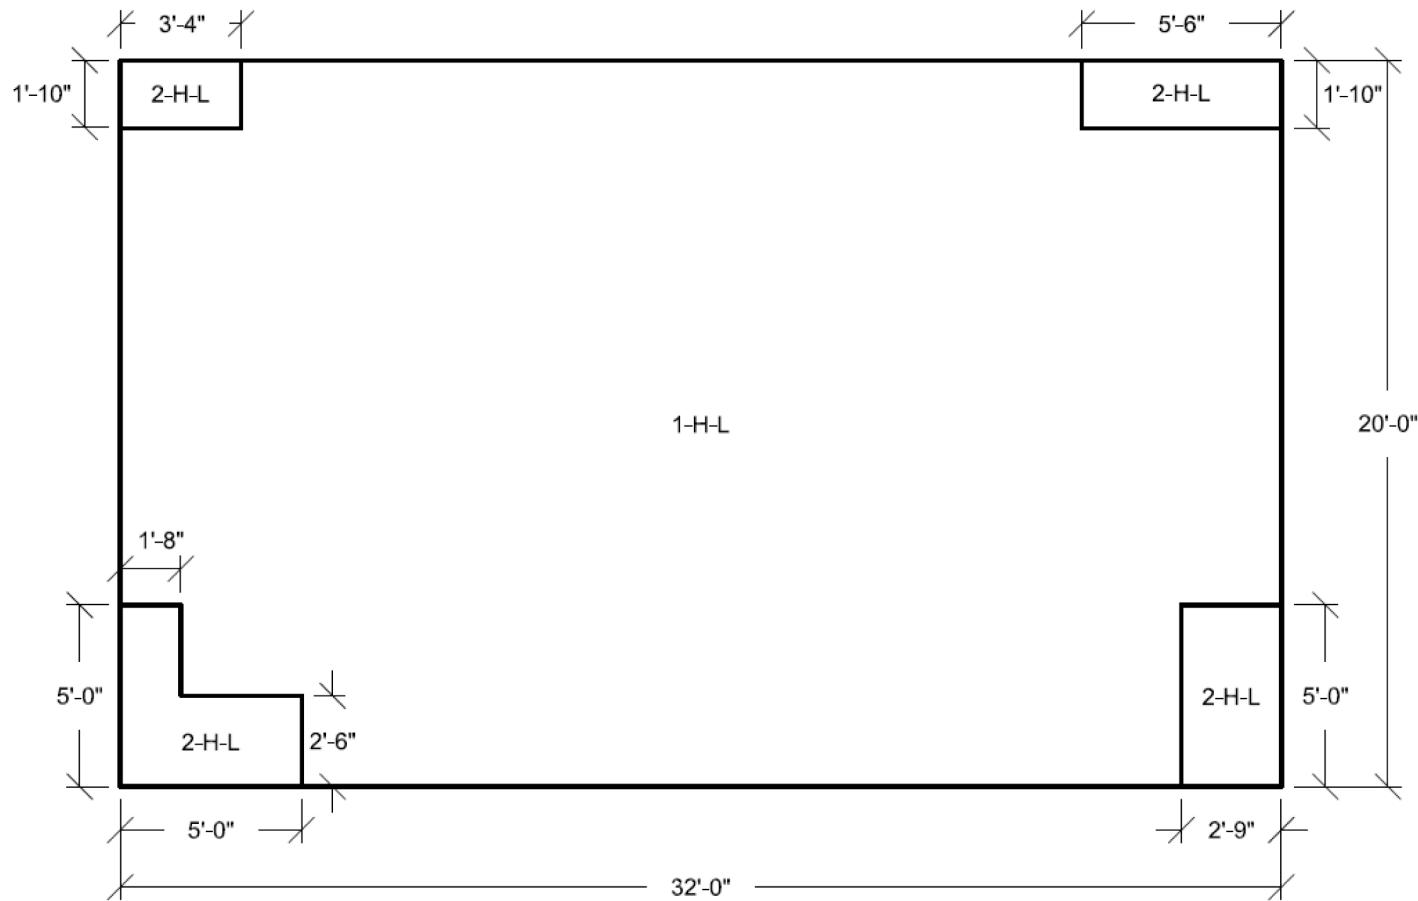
H.6-199 DGFOSV Wall 14 Looking From Outside
